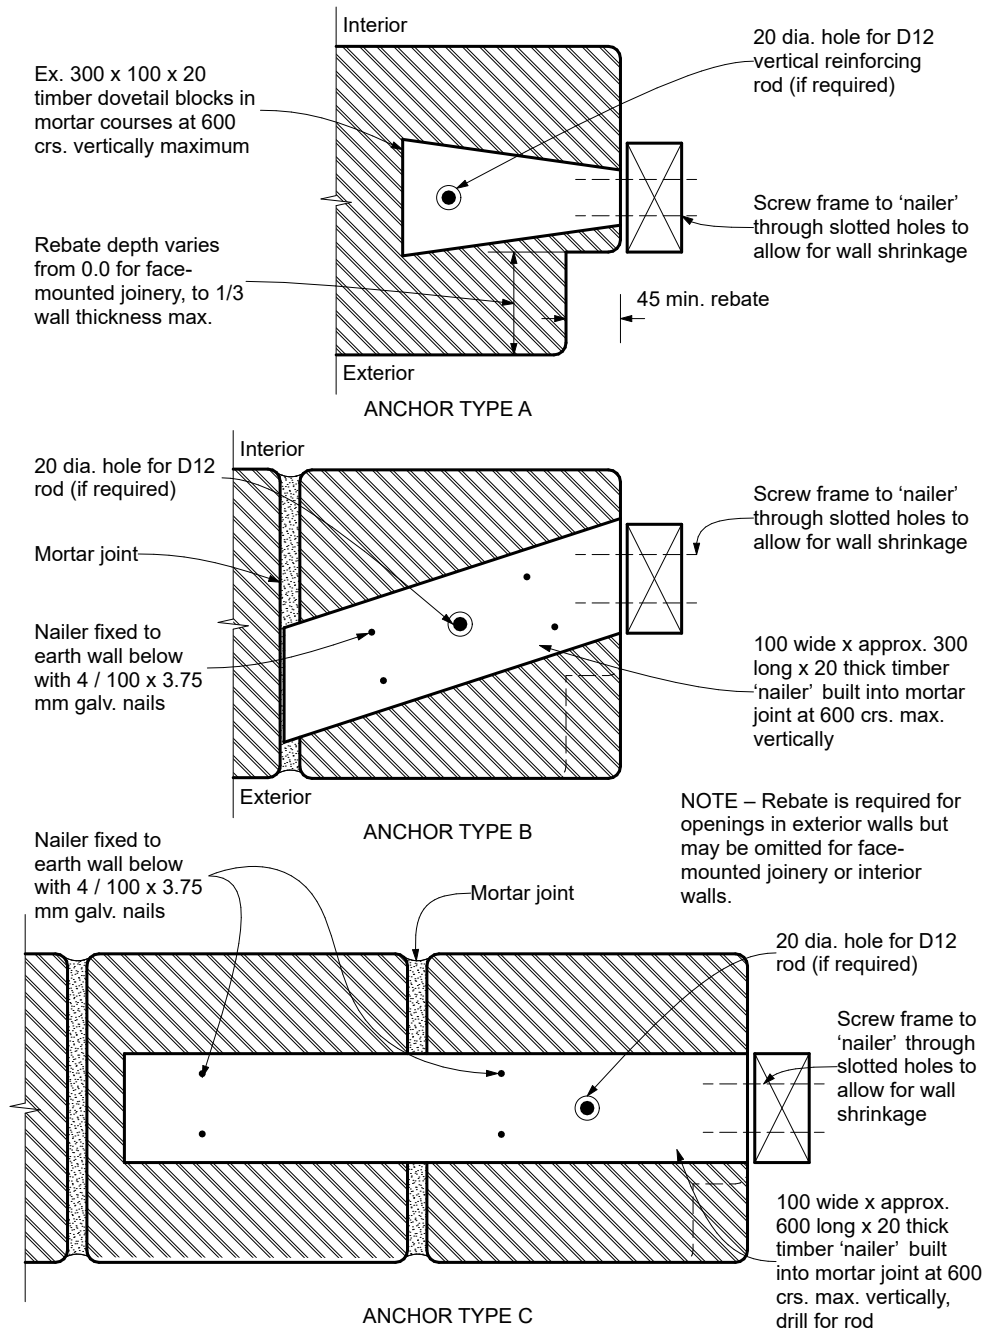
Anchors for door, window, and timber partition frames for earth walls
